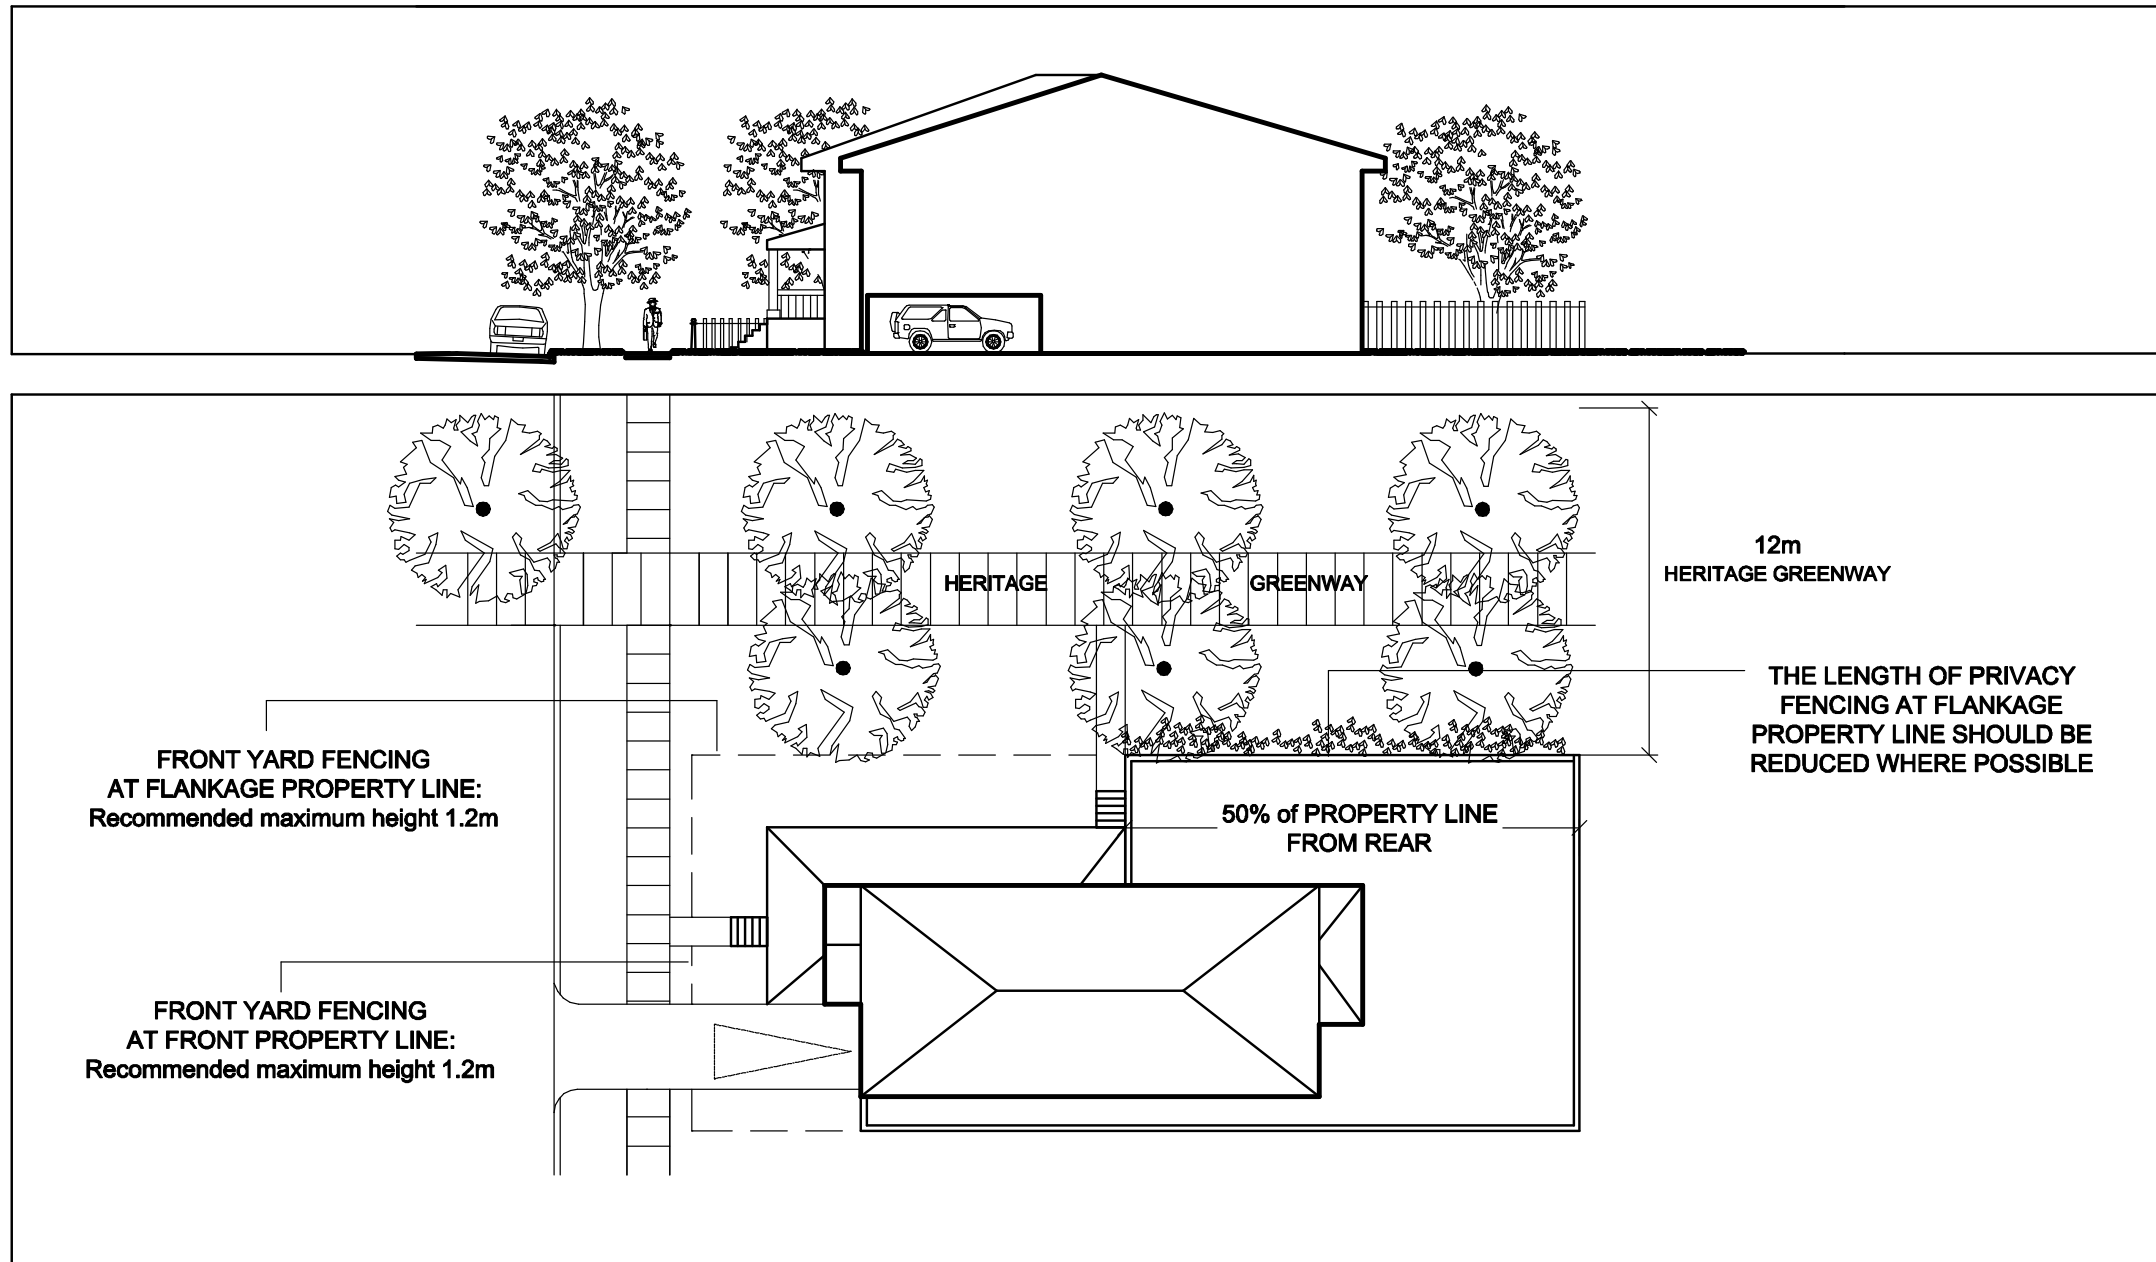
Fence Guidelines- Flankage lot adjacent to Heritage Gateway. A Corner lot of a single detached house with attached garage
